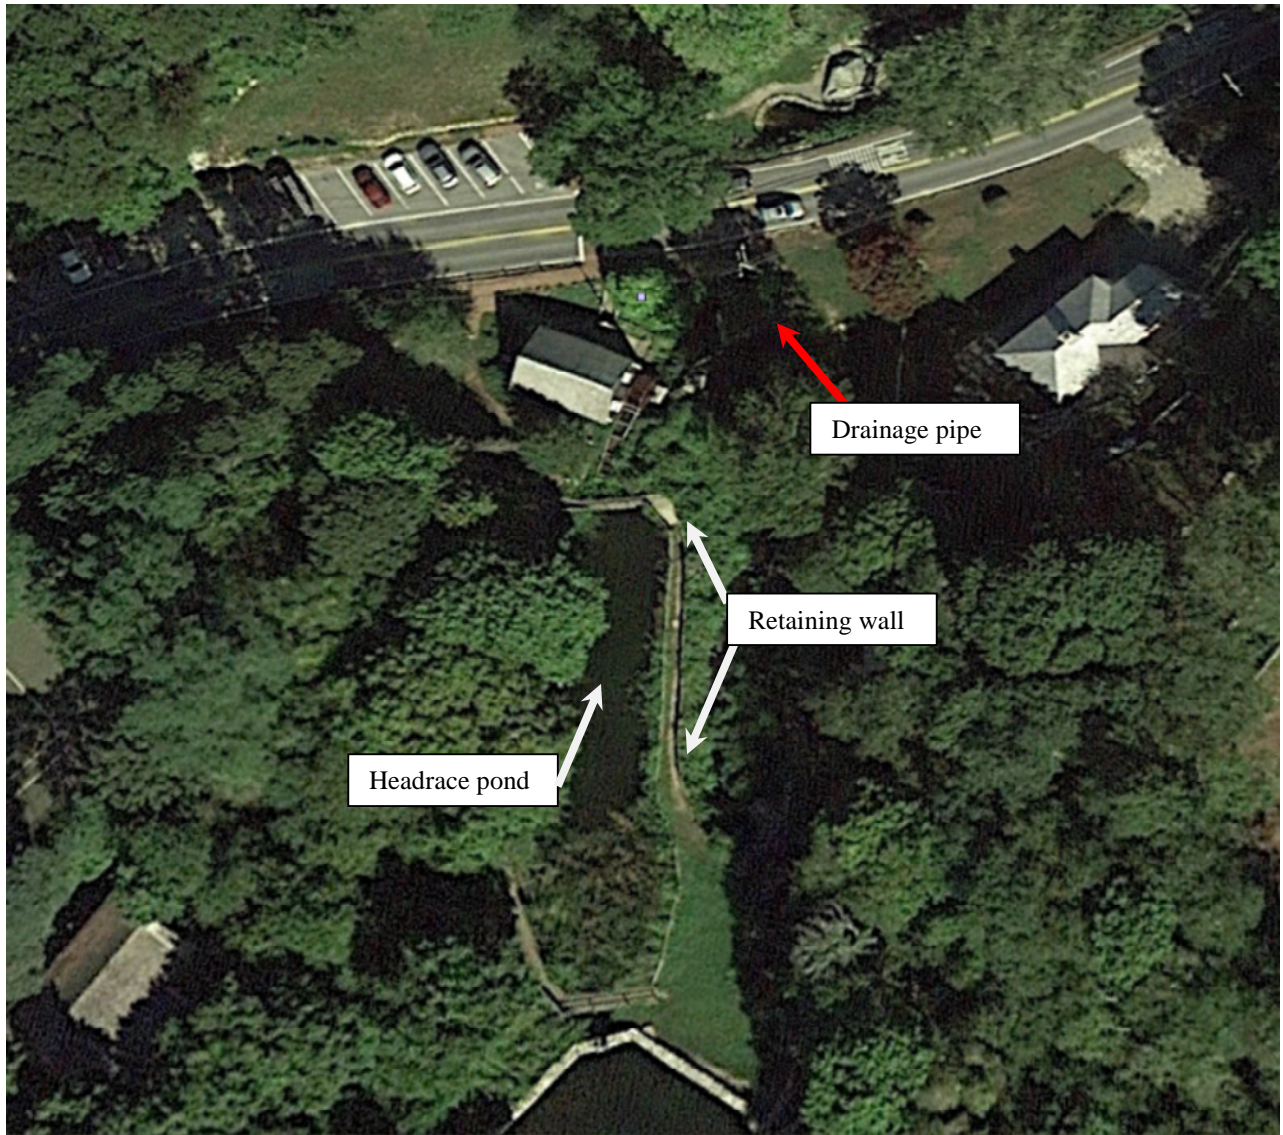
Aerial showing dam (at bottom) and Stony Brook Road to north. Note main section of retaining wall with foot path above, supporting the headrace pond used to run the mill wheel. Red arrow shows area of wall slumping at drain structure outfall in main pool.
